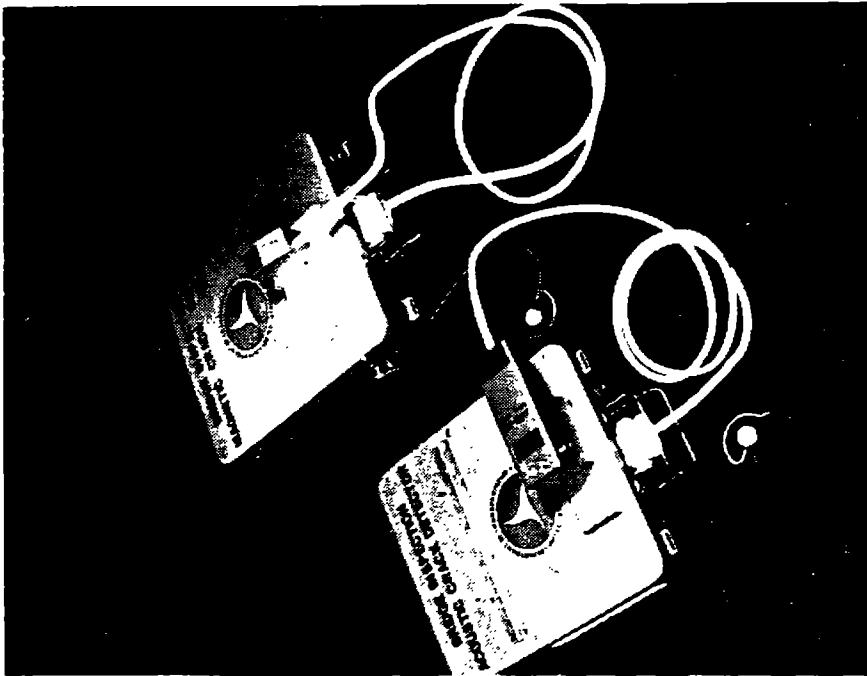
Acoustic Crack Detector/Magnetic Crack Definer (ACD/MCD) Steel Bridge Inspection System (5)
